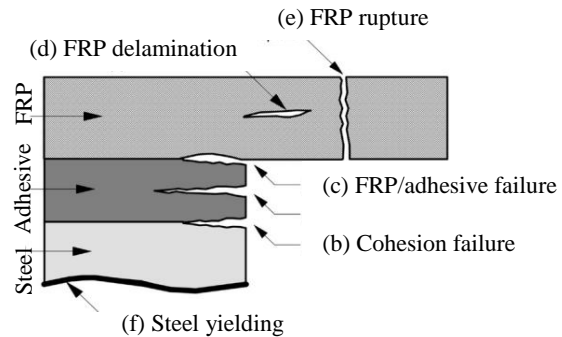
The failure modes of a CFRP strengthened Steel joint [3]
